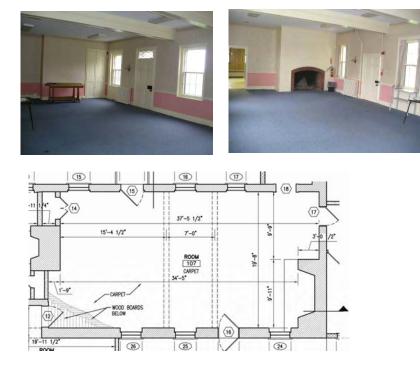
View looking southwest in room 107 (top left); View looking northeast (top right). GWWO photo, 2005. Floor Plan room 107 (bottom).
